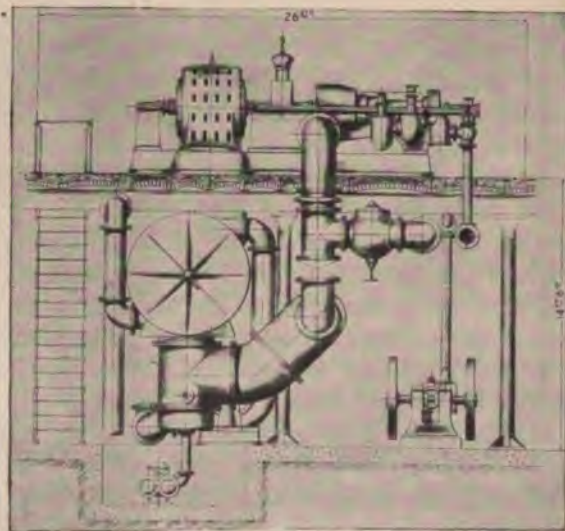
POWER-HOUSE CONTAINING FOUR 400-KW WESTINGHOUSE-PARSONS STEAM TURBINES AND CONDENSERS. SIDE ELEVATION
